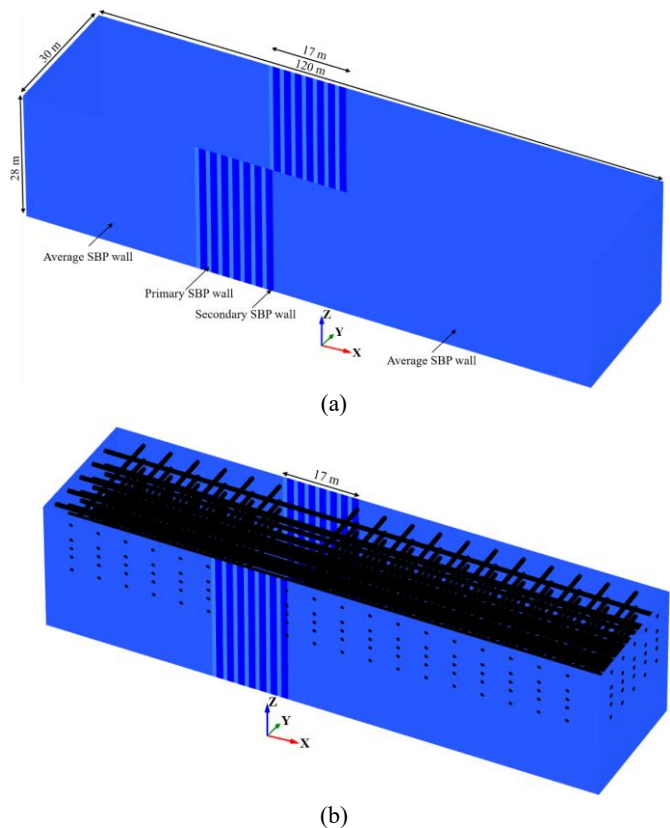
Detail supporting system in PLAXIS 3D: (a) Plate element (retaining wall); (b) Node to node element (struts)
